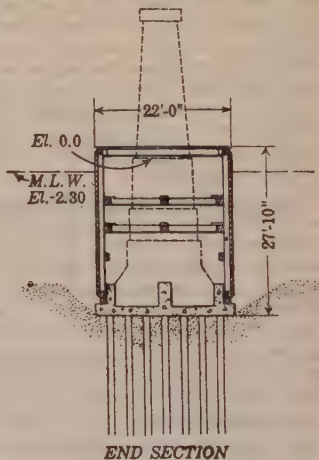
Pier Caissons, Newark Bay Bridge, C.R.R. of N. J.
